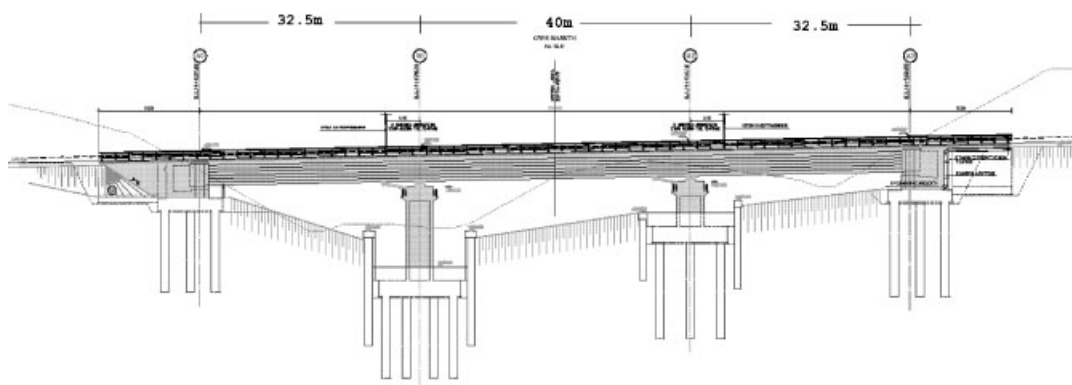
Elevation of a three-span, 105-m-long, seismically isolated bridge.
